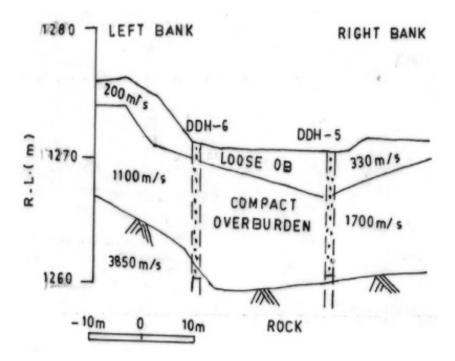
(c). A typical cross section of traverse 23 at dam axis area.
